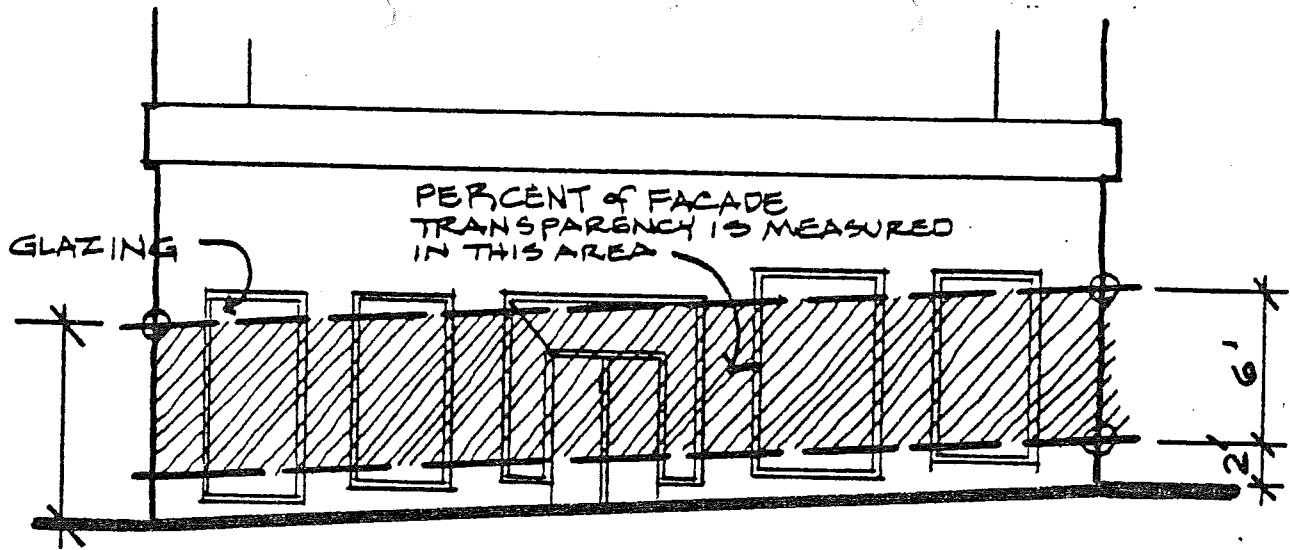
A STREET FACADE TRANSPARENCY
